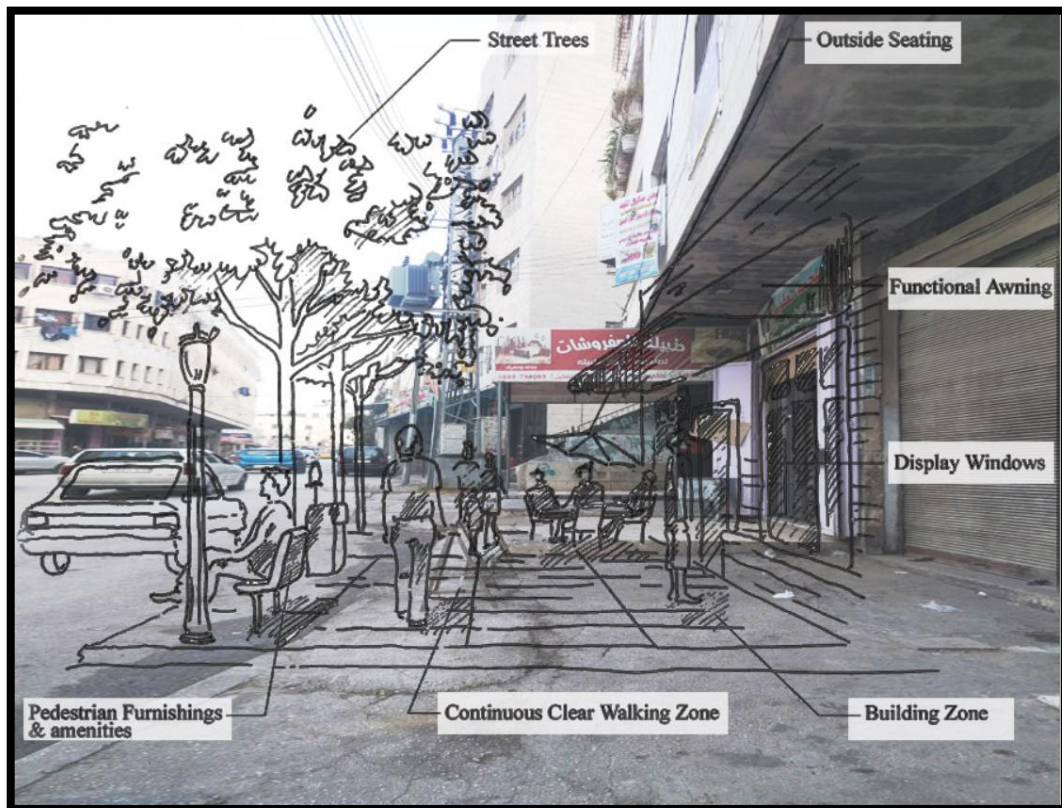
5: Sidewalk shopping windows improvements. Adapted by the resercher from source (Site survey,2018)
